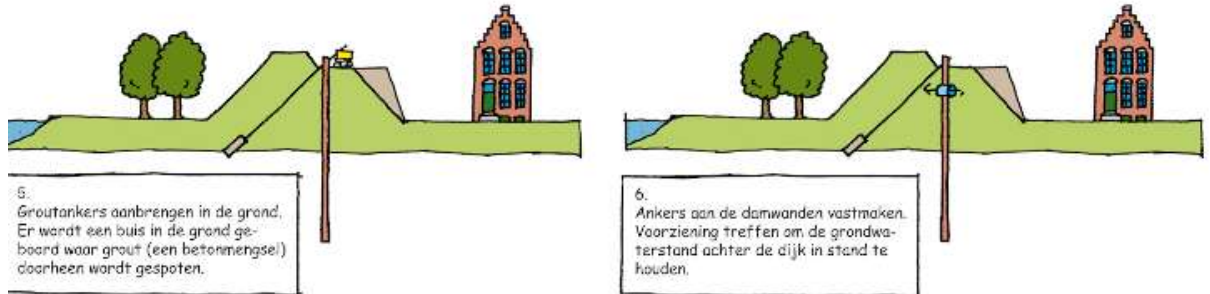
Schematic cross section of situation 5: construction of grout anchors (left) and situation 6: fastening of anchors to sheet pile wall and add provision to diminish the influence of the sheet pile wall ground water levels (right).
